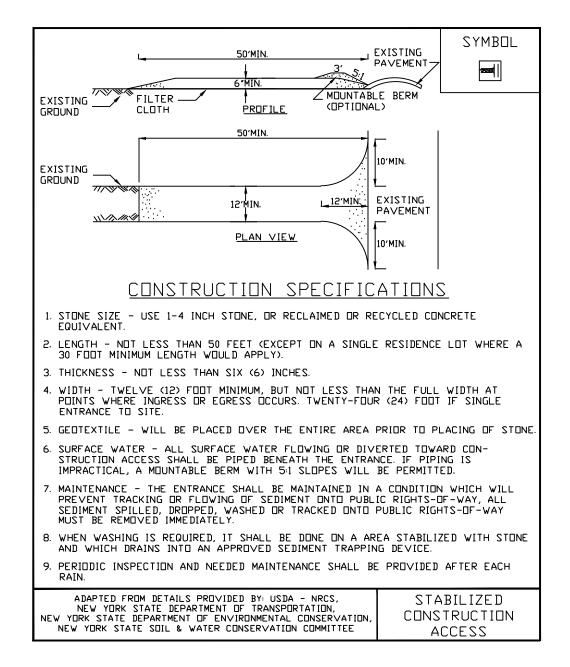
STABILIZED CONSTRUCTION ACCESS
